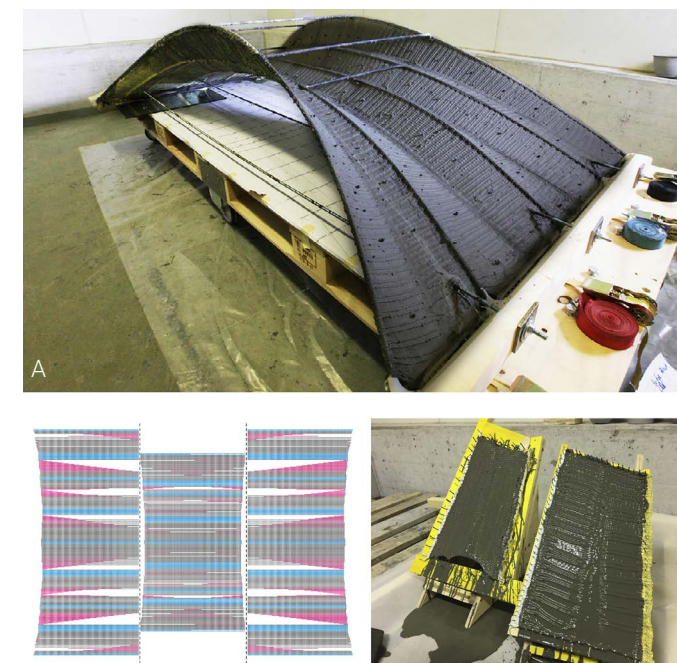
Construction of the concrete shell bridge prototype after a cement paste coating was applied (B) Knitting patterns used to fabricate the bridge alongside cement coating tests of different knit pattern swatches (Source (all): Popescu et al., 2018)
